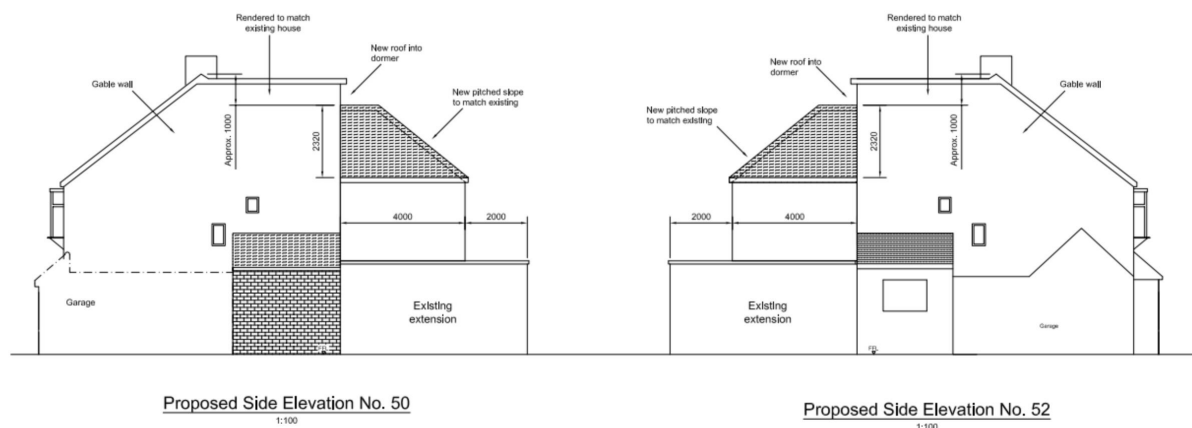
; Side elevation of 50 & 52 Hyland Way, RM11 1DW
